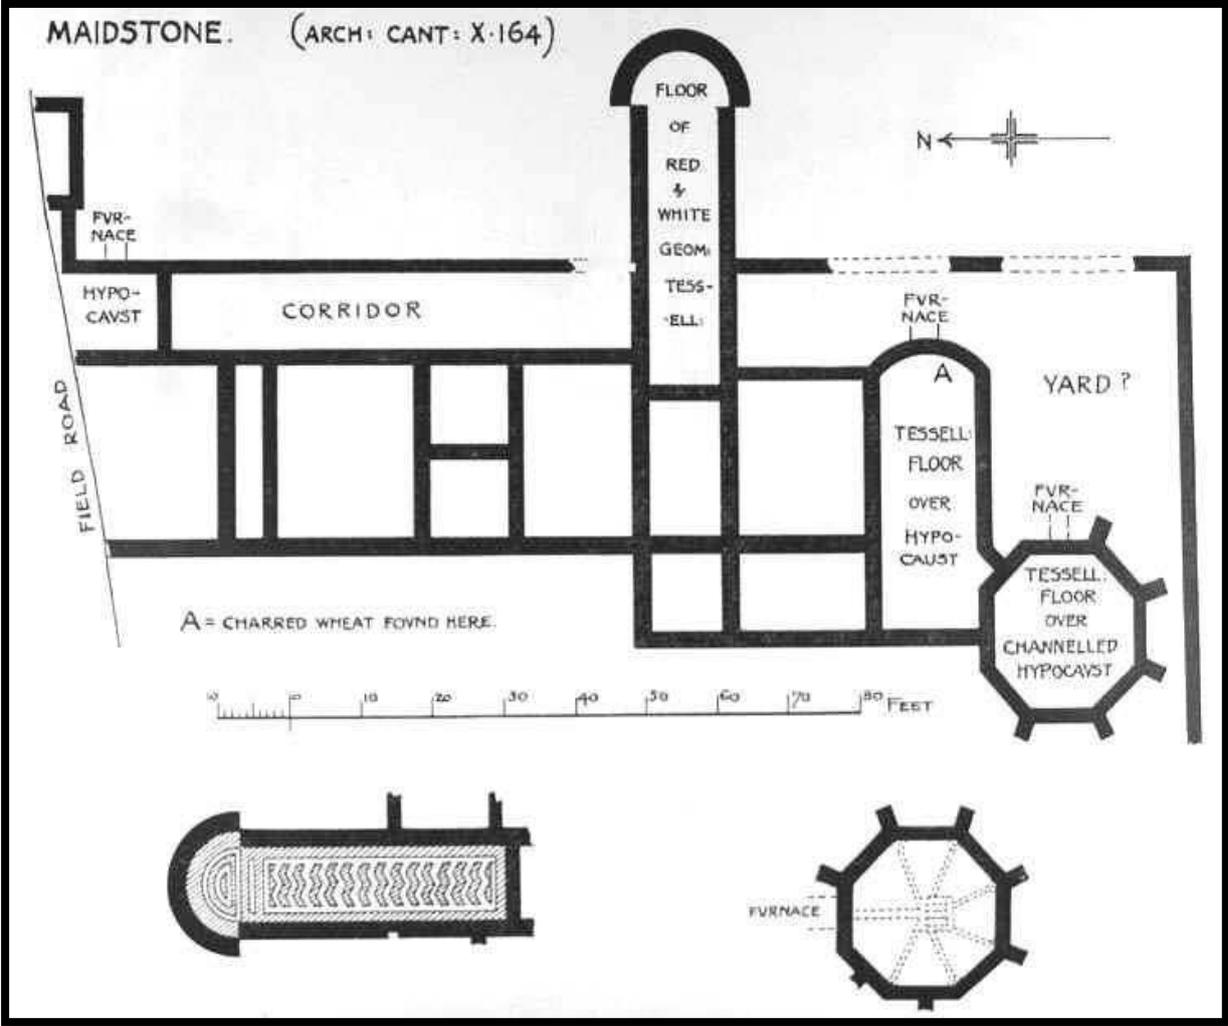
Roach-Smith's (1876, 166) original floor plans of the 1870 excavation of the Barton Roman villa, Maidstone. Bath house at bottom right. Victoria County History.
